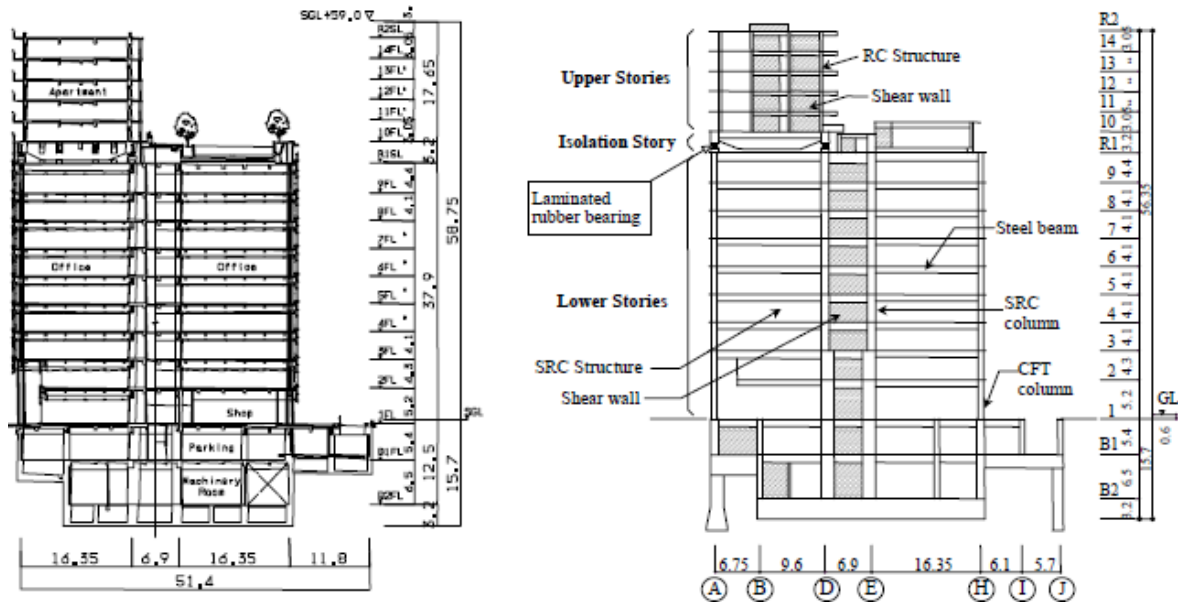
Sectional view and framing elevation of the mid story isolation building (Murakami et al 2000)
